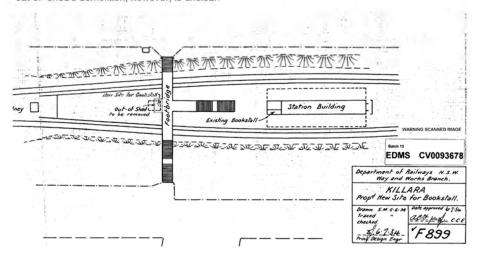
Plan for removal of out-of shed for a new bookstall, c. 1934 (Sydney Trains Virtual Plan Room)
